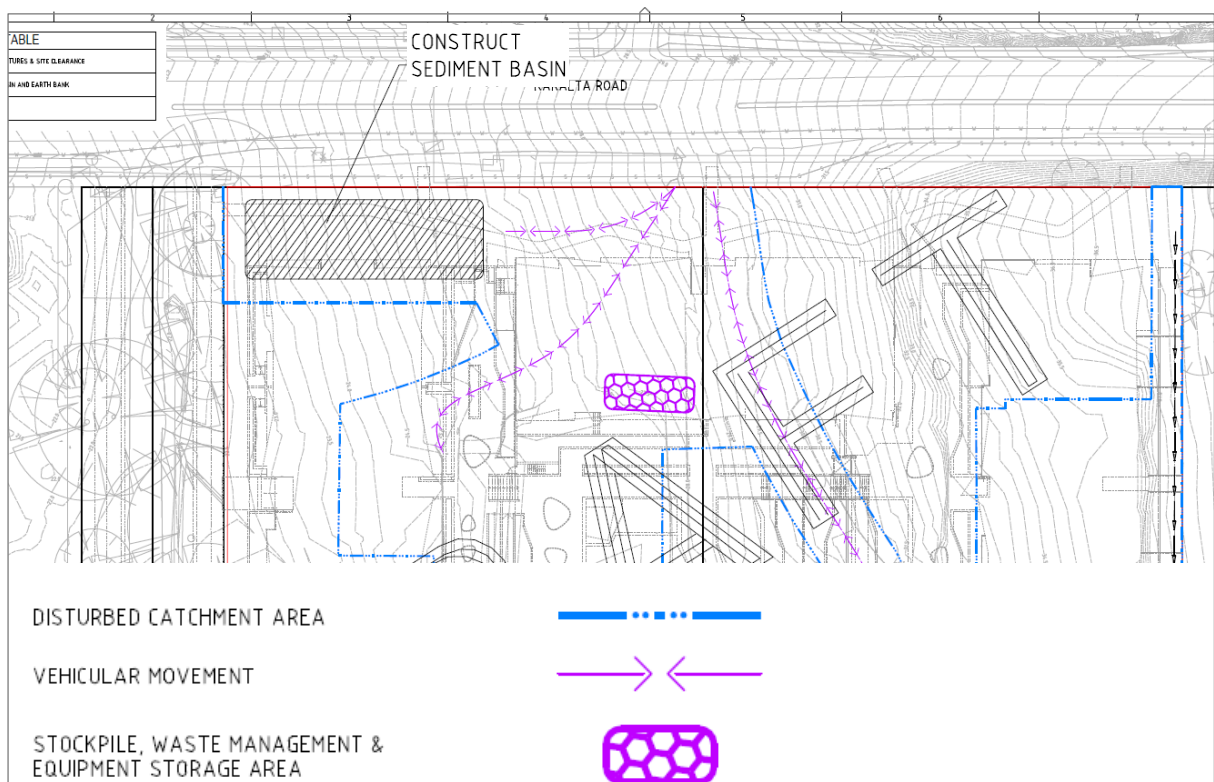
Concept Construction Management Plan Stage 2 - PS01-B101 Rev A
